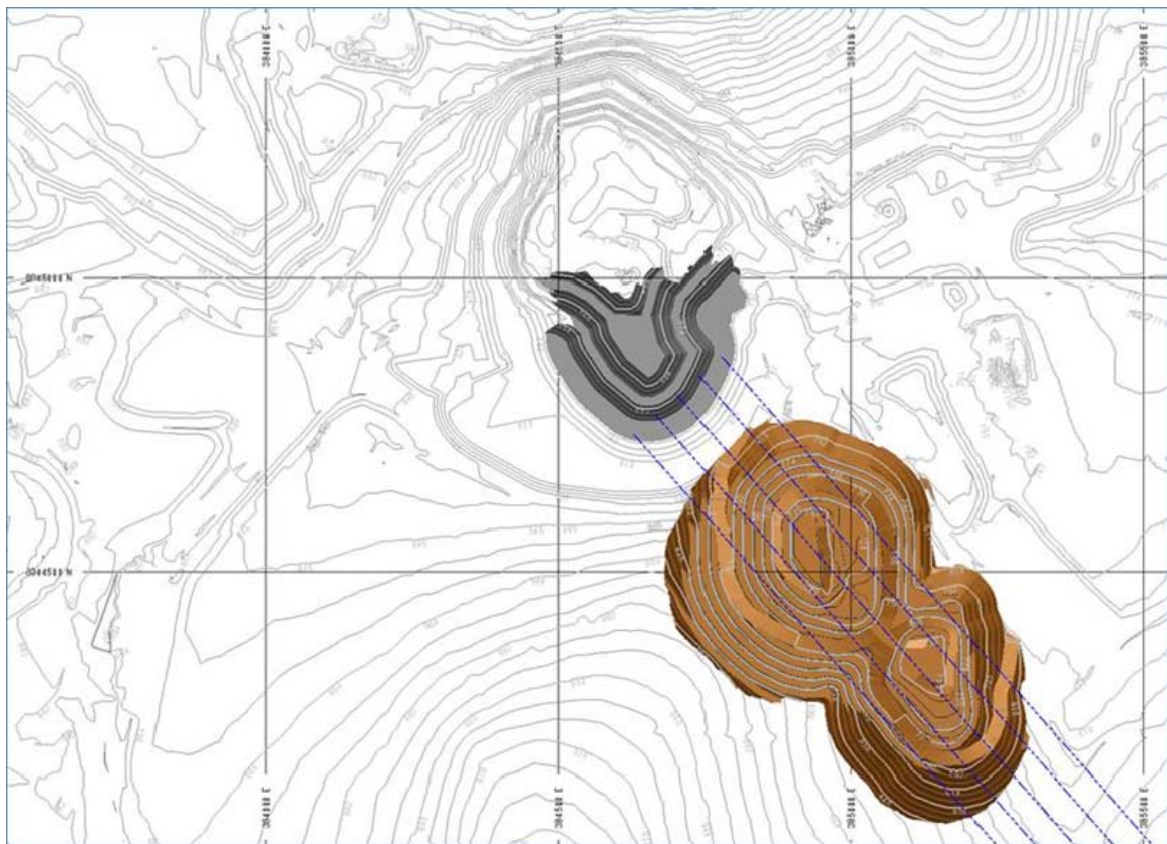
Site Topography and Proposed Pit and Buttress Layouts
